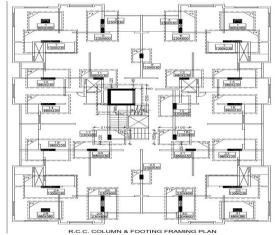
R.C.C. COLUMN & FOOTING FRAMING PLAN
